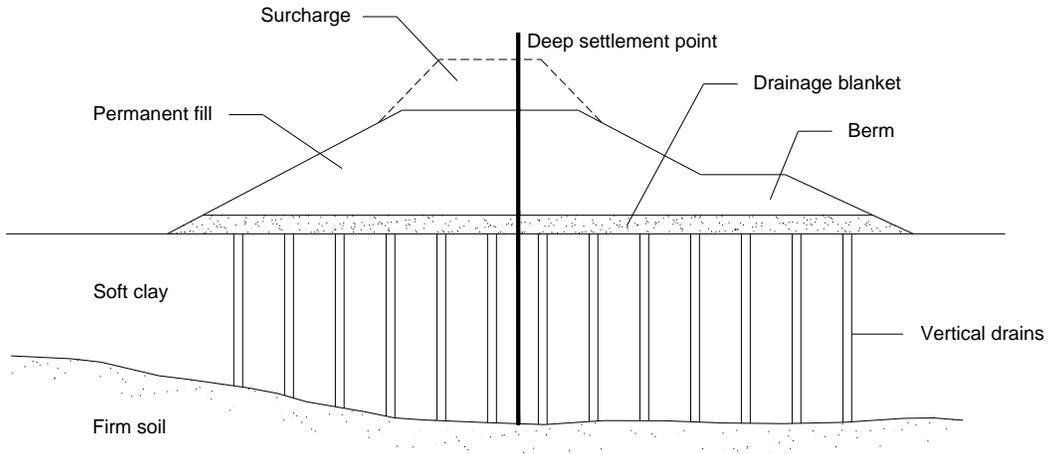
Typical vertical drain installation for highway embankment (Rixner 1986)
